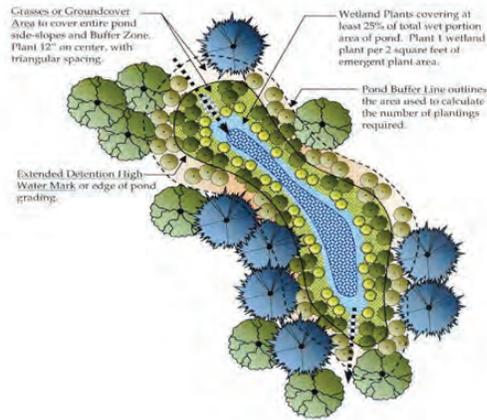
TYPICAL PLAN LAYOUT FOR A CONSTRUCTED WETLAND
